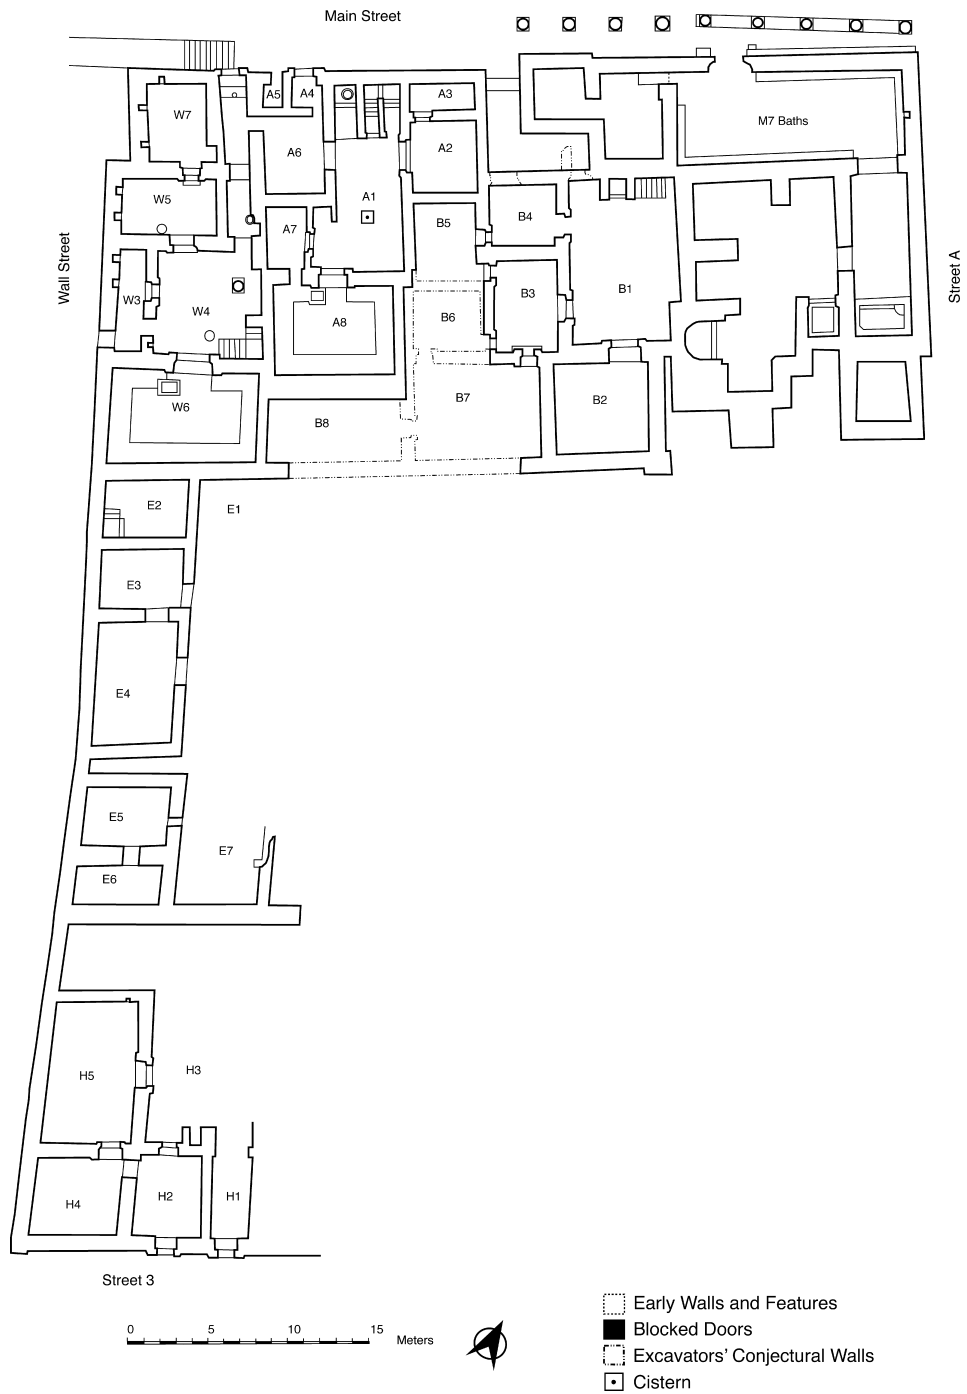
M7 Plan. Empty area was unexcavated, where preservation was poor due to destruction for Wall Street embankment. Plan by the author after originals by van W. Knox and A. H. Detweiler in the YUAG Archive.
